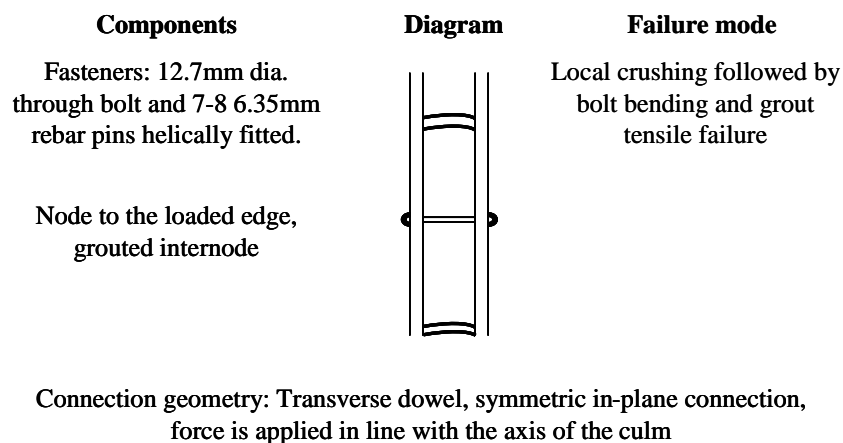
Grouted internode with fastener connection (adopted from Trujillo 2007).
